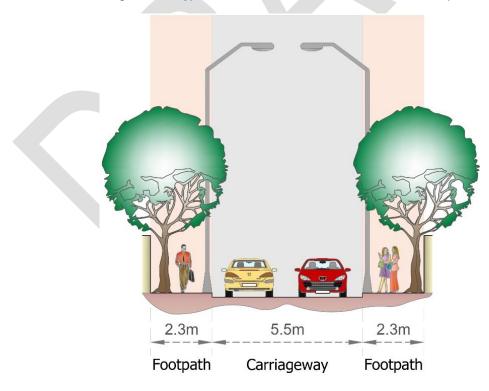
Typical Cross Section of 10m Wide Road with Footpath
